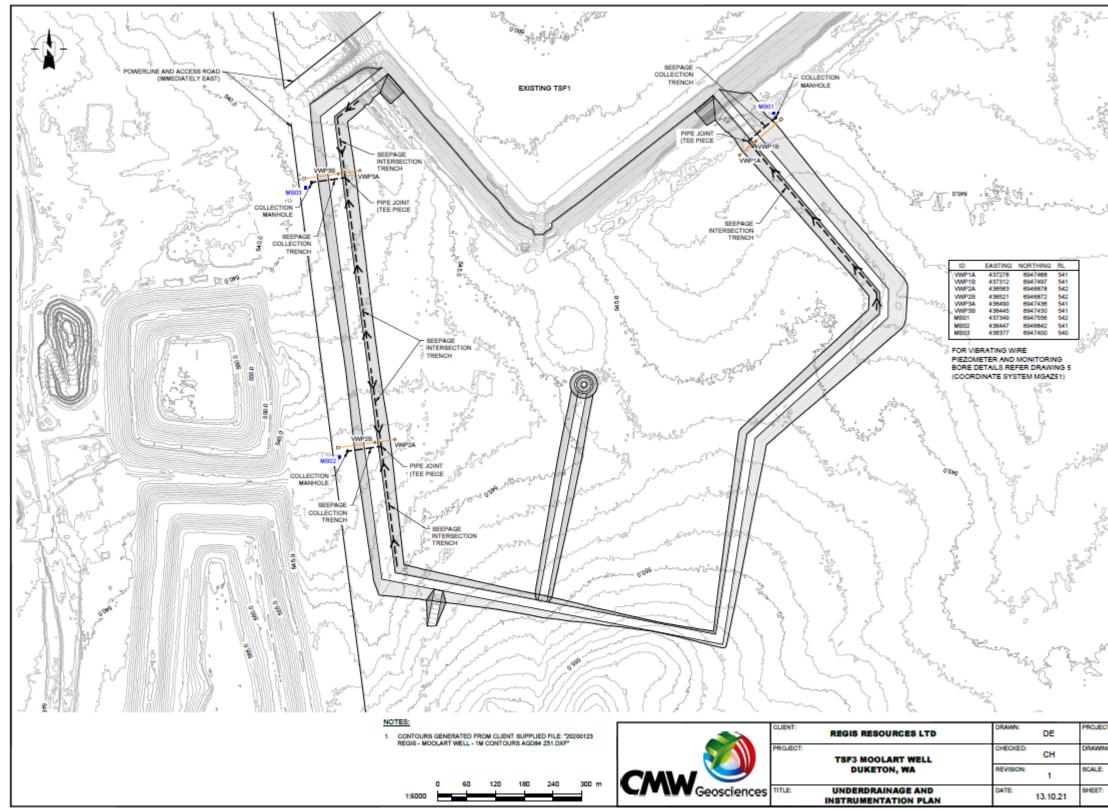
Moolart Well TSF3 – Underdrainage and instrumentation plan.
